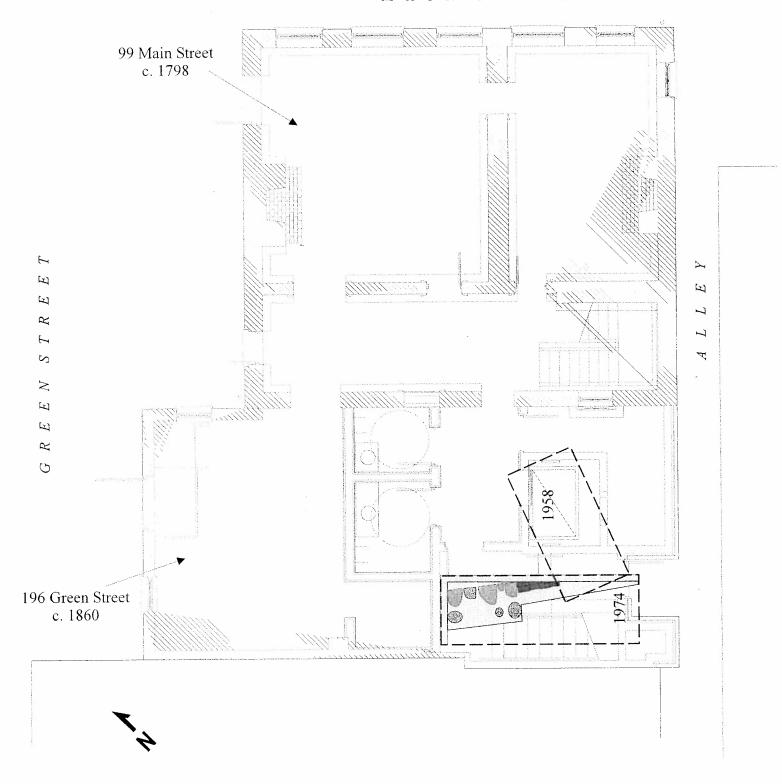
Proposed floor plan of the Annapolis History Center, First Floor, showing locations of previous excavations
